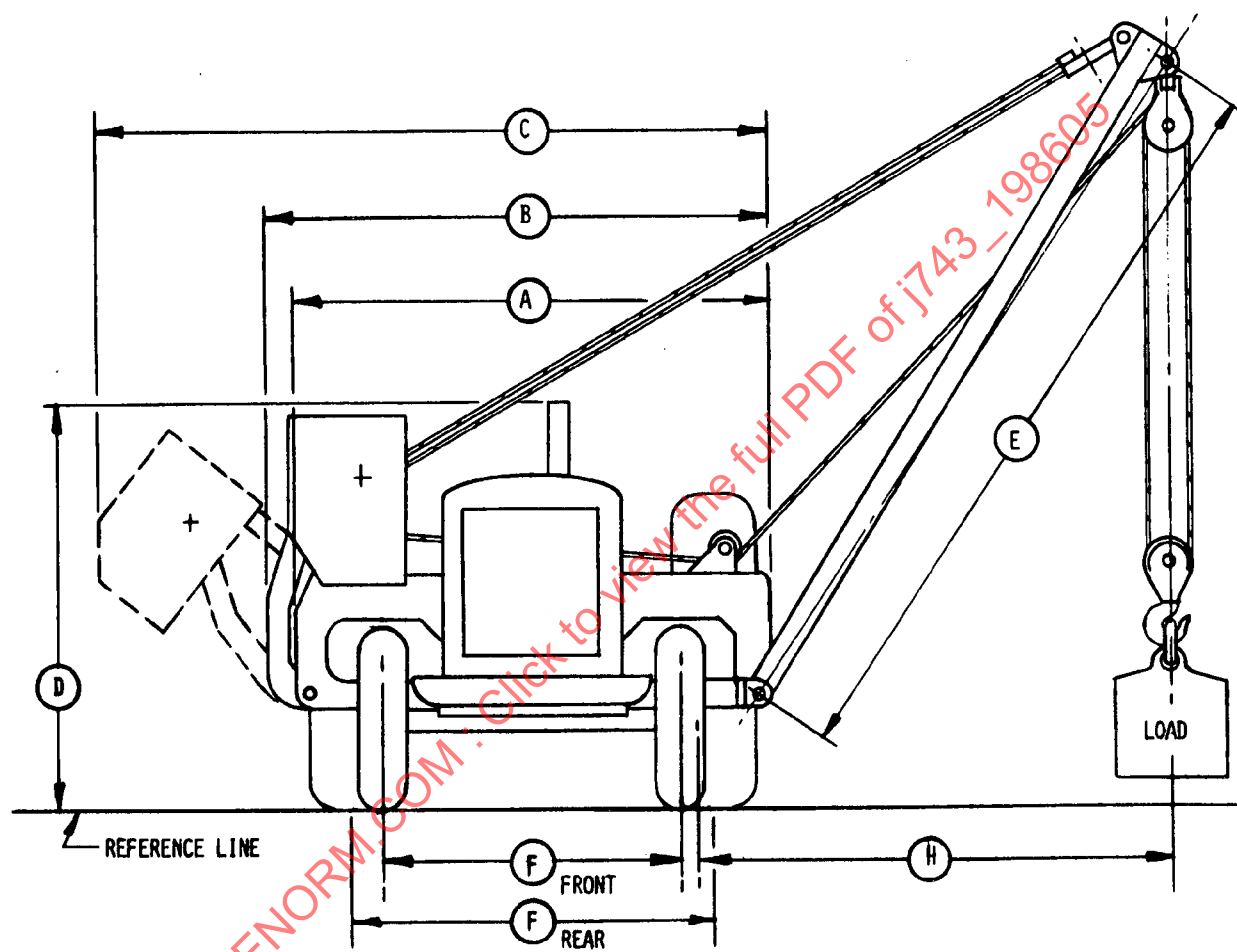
WHEEL TRACTOR STEERED STRAIGHT
